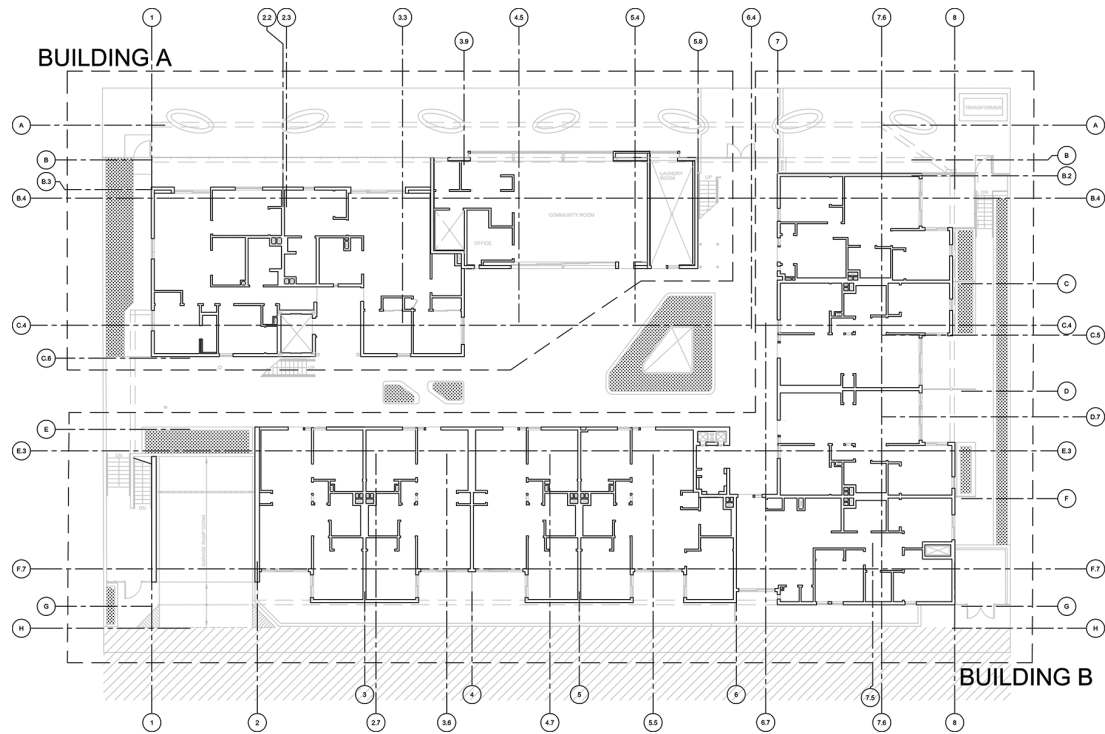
First-floor plan—Buildings A and B sitting on a common podium deck
